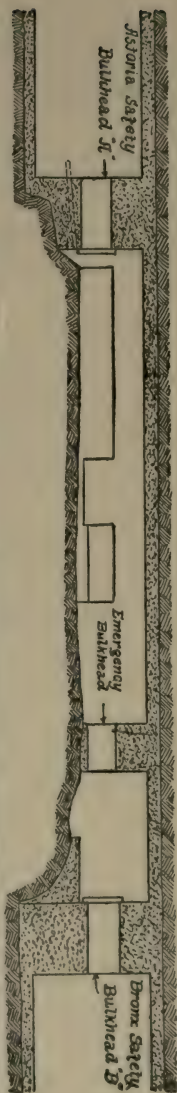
SECTIONAL VIEW OF THE TUNNEL AT THE POINT WHERE THE TROUBLE WAS ENCOUNTERED.
